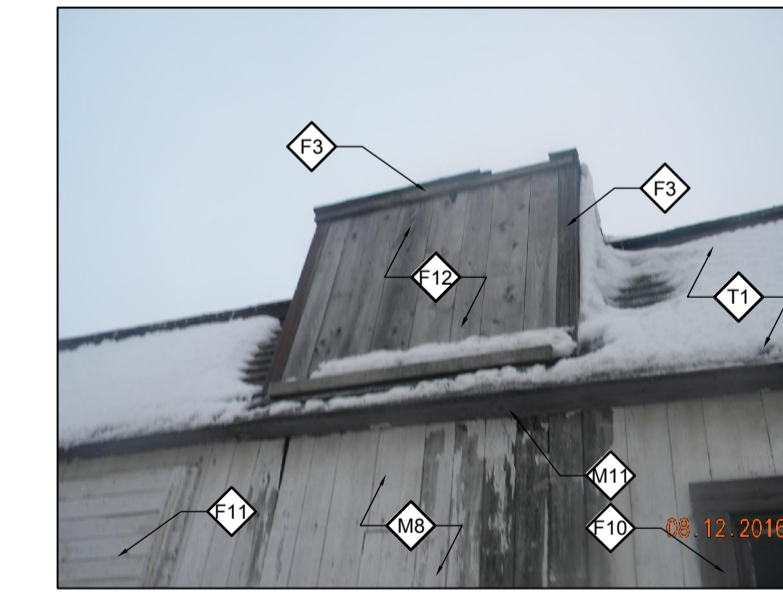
WINDOW DORMER COVERED WITH VERTICAL CLADDING BOARD TO BE DEMOLISHED
